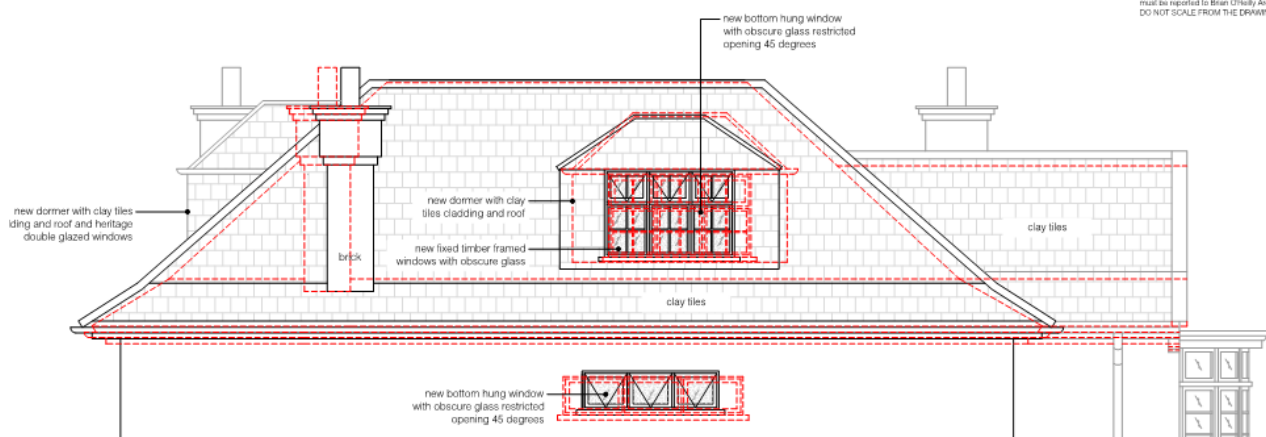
Proposed front elevation (red line denotes previously consented outline)
